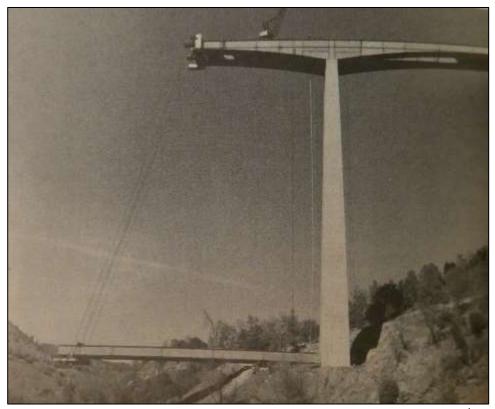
The center section of the main span being fabricated at the base of Pier 4.4
